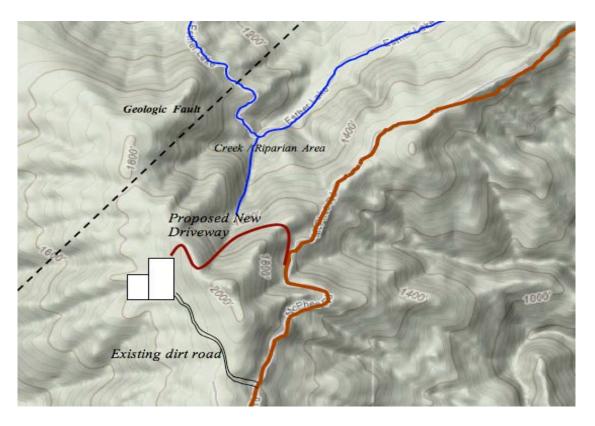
Where feasible, use existing 'dirt' road as improvements for access to the property, instead of creating new and additional driveways.
